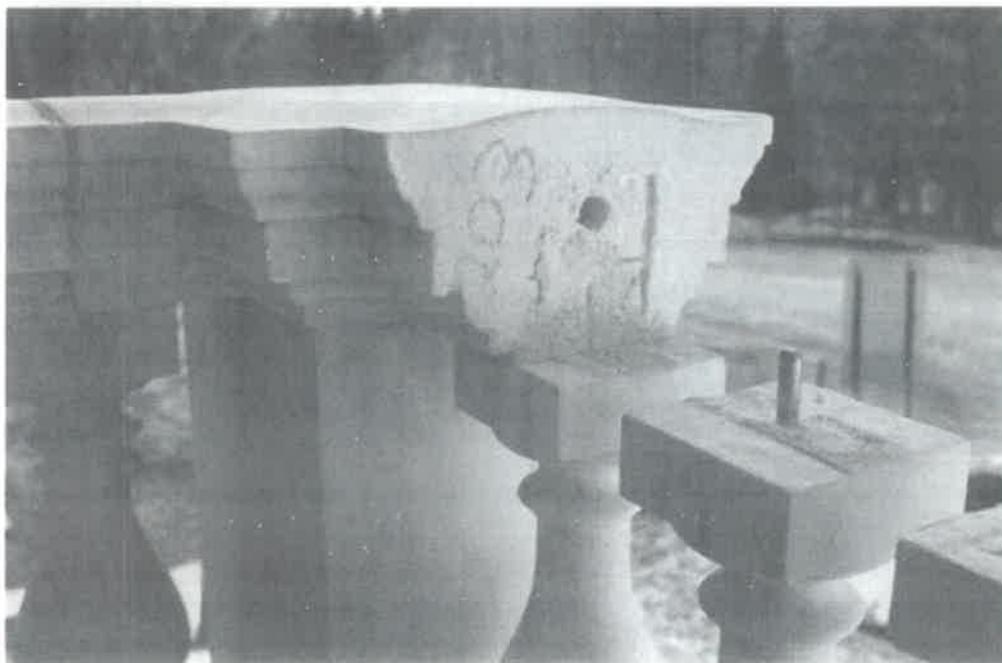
Long or thin cast stone elements require reinforcement. When possible, reinforcement of new cast stone should be made of stain less steel.
